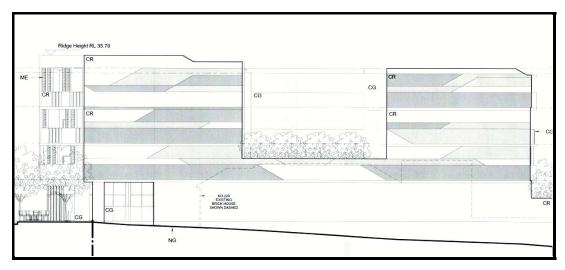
Approved Development on the adjoining site - Bunnerong Road frontage (Source: Sgammotta Architects, 5 September 2013)
